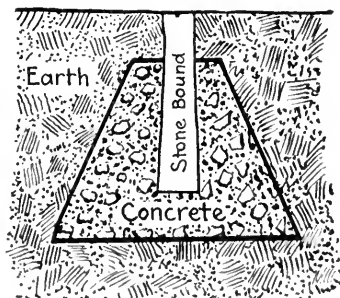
STONE BOUND WITH CONCRETE FOUNDATION.
